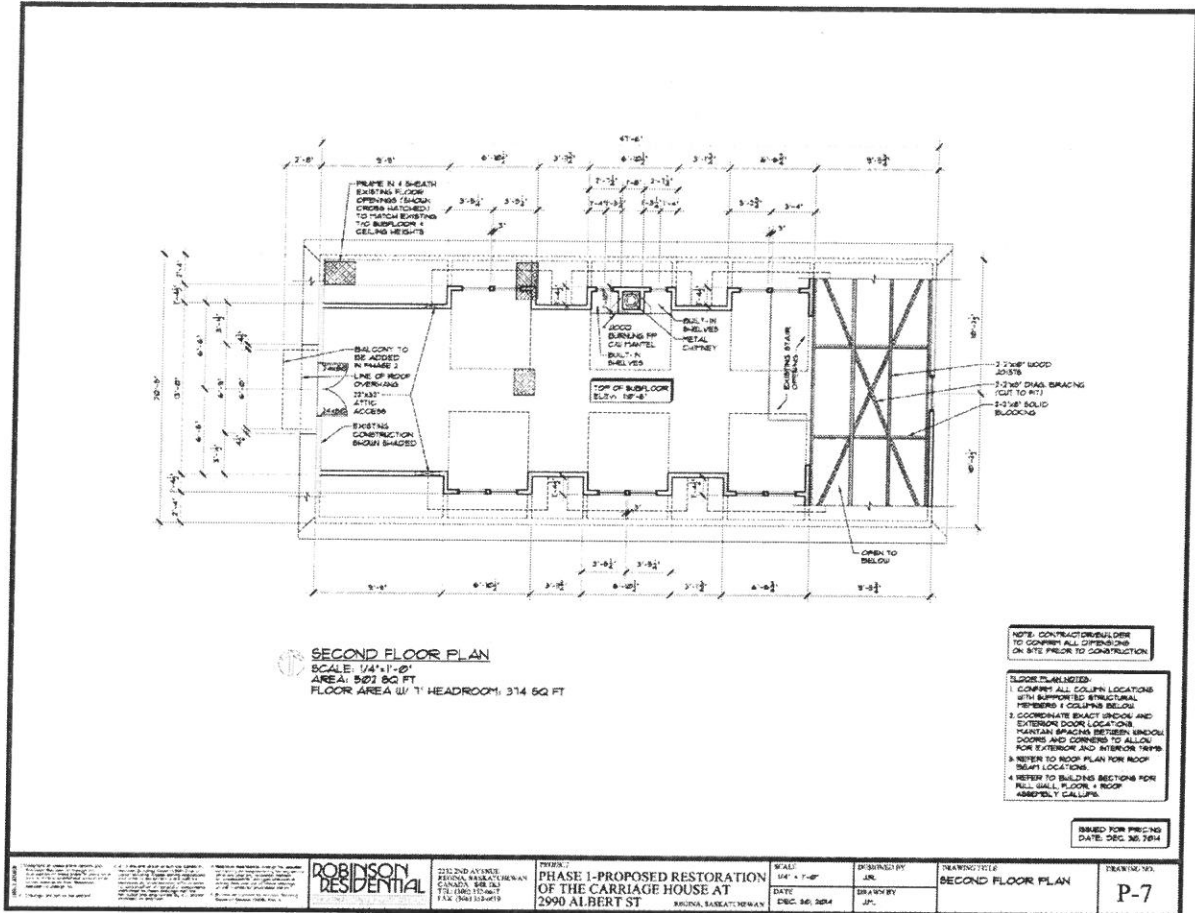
The upper floor plan of the carriage house after the proposed rehabilitation.
